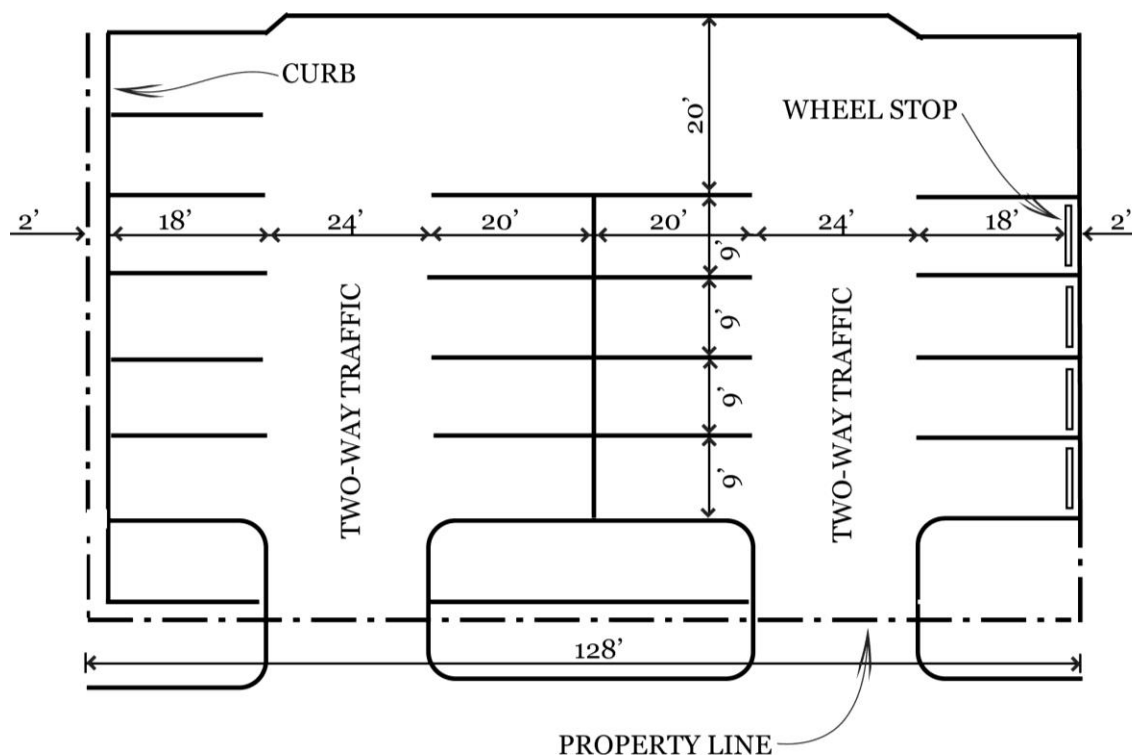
Parking Stall and Aisle Dimensions--90°Angle Stalls
